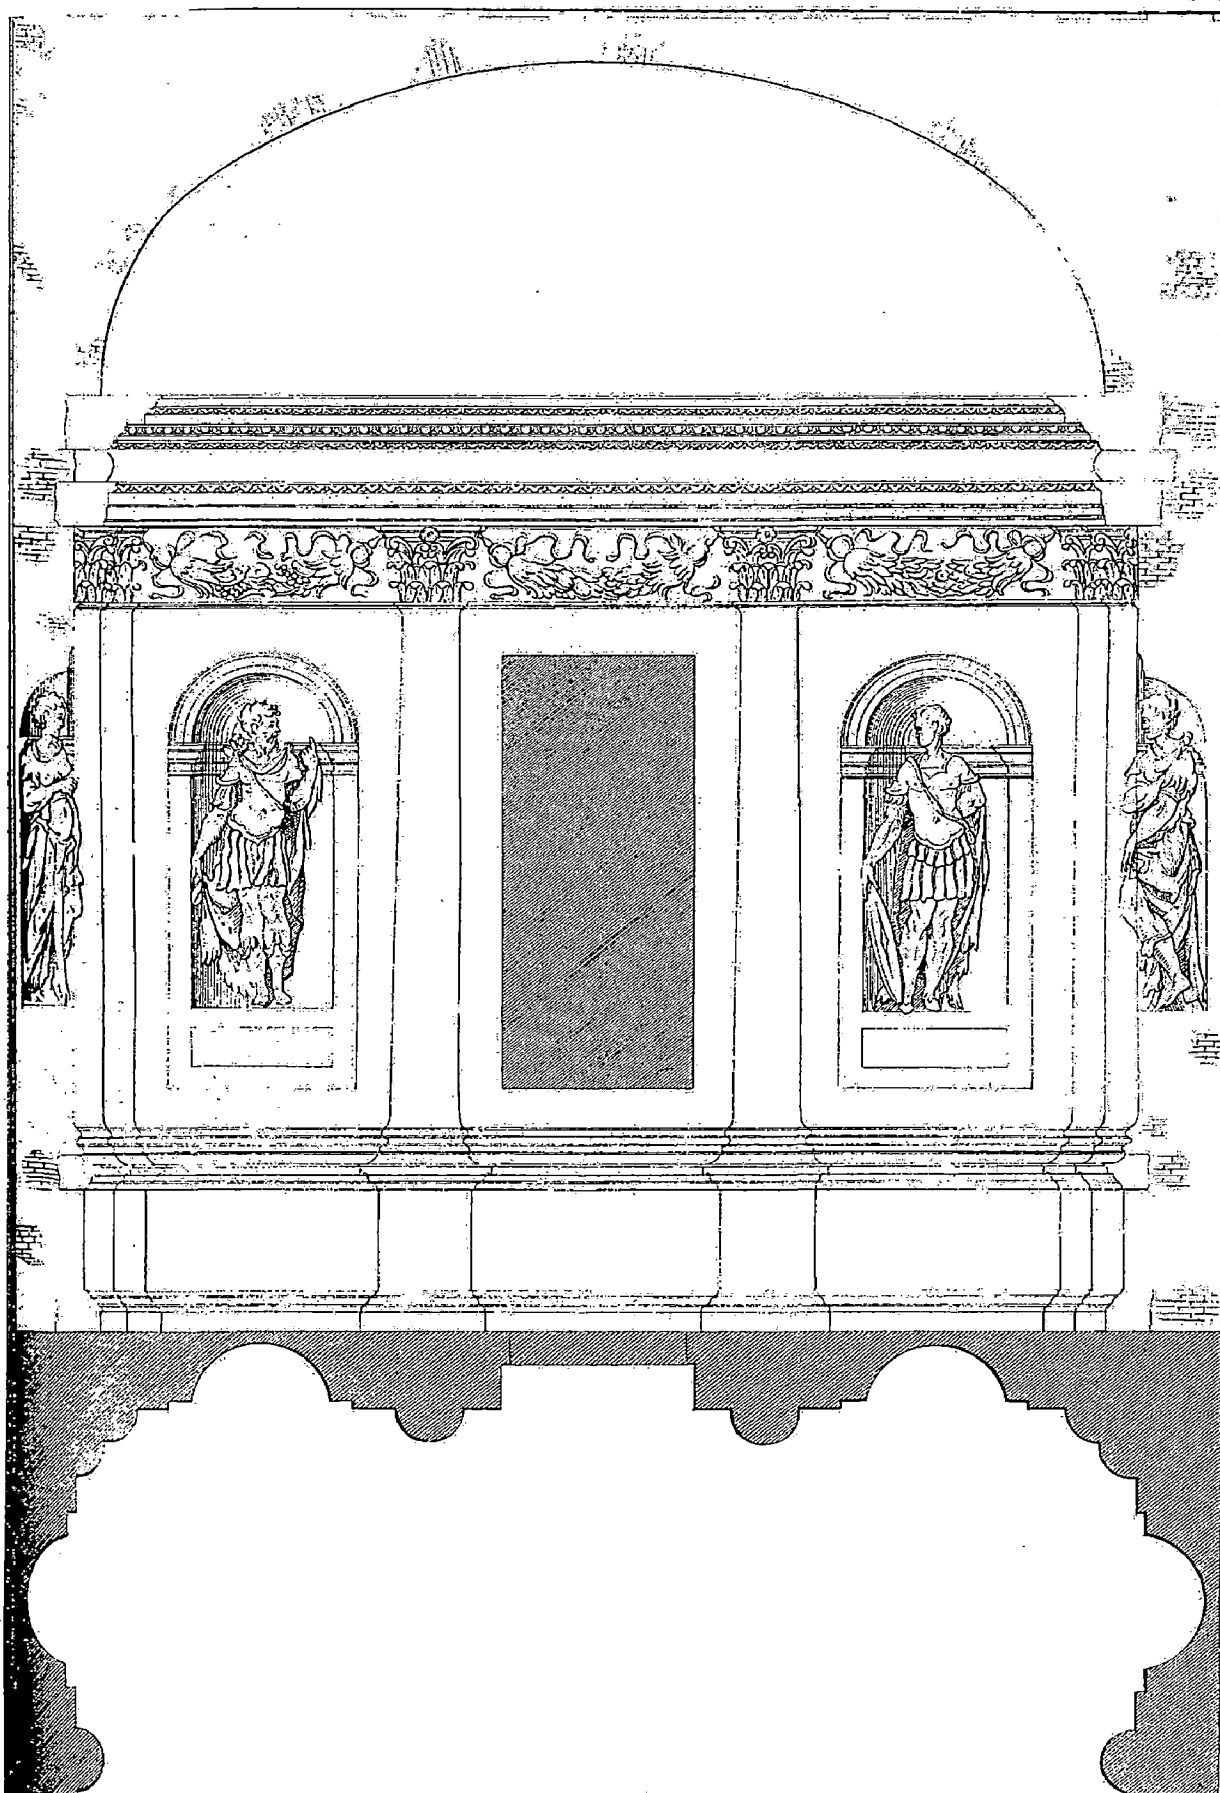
A Corinthian hall with half-columns and pedestals in partial plan and sectional elevation
